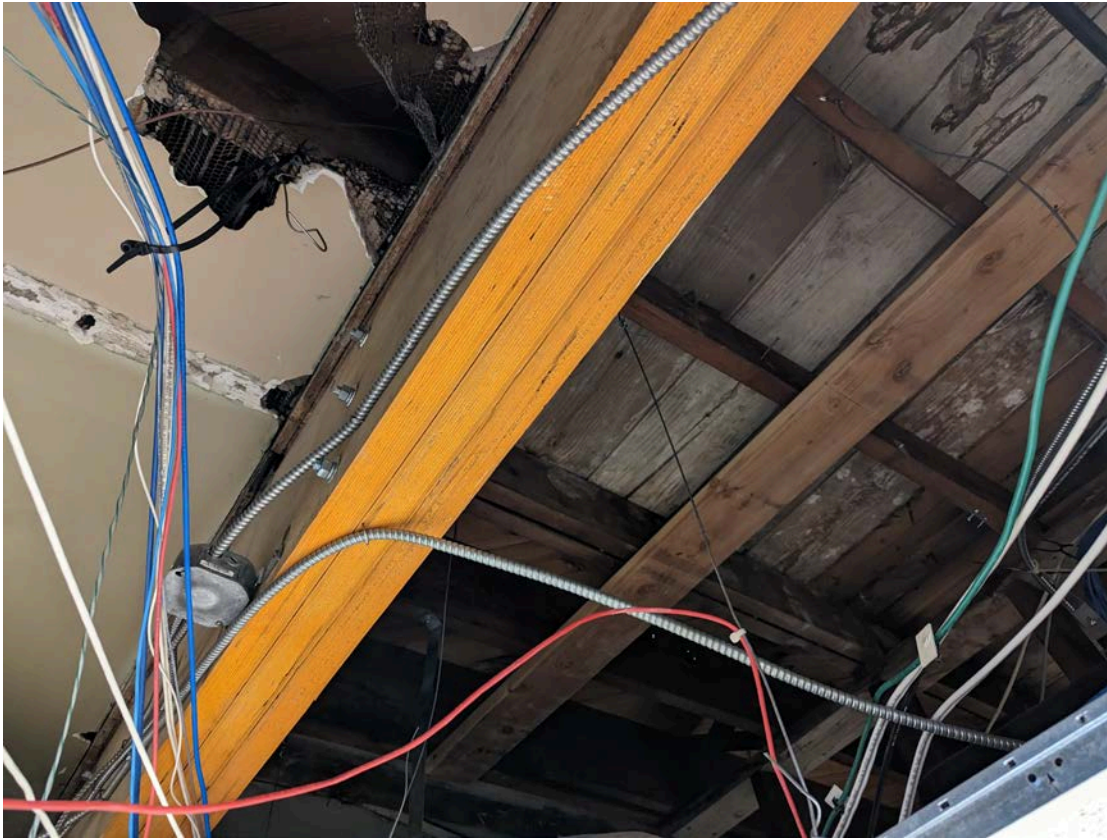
Dropped LVL Beam & Exposed 2nd Floor Framing at Southeast of Building.
